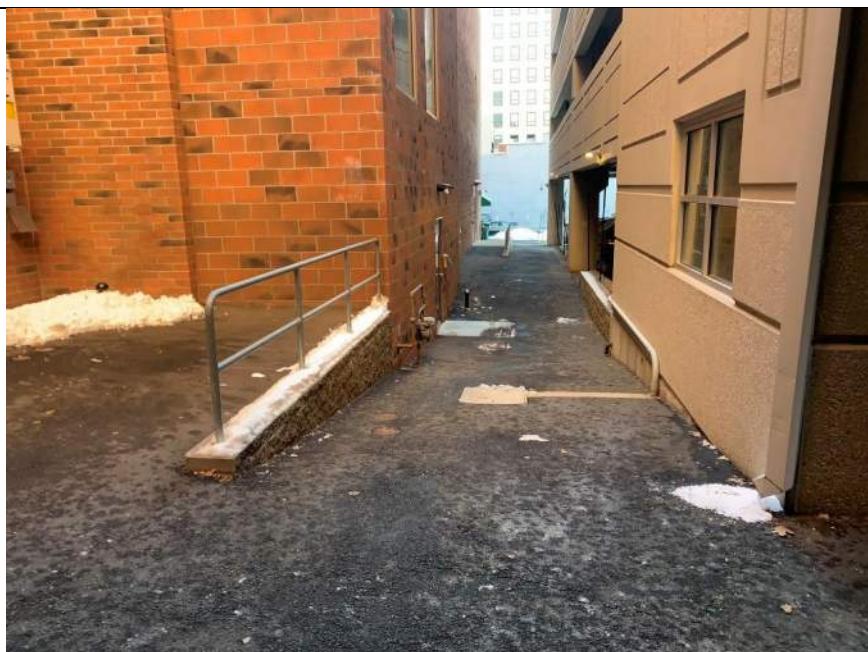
Looking southeast; paved surface cover between 140 State Street (to the left) and the parking garage (to the right) (12/14/22).
